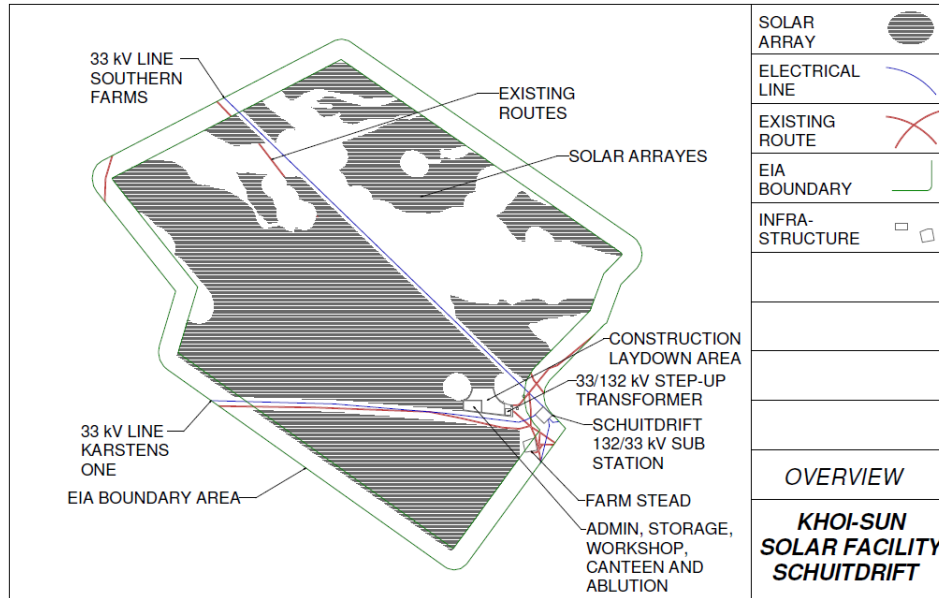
Layout Alternative 4 - Preferred / Mitigated Layout
